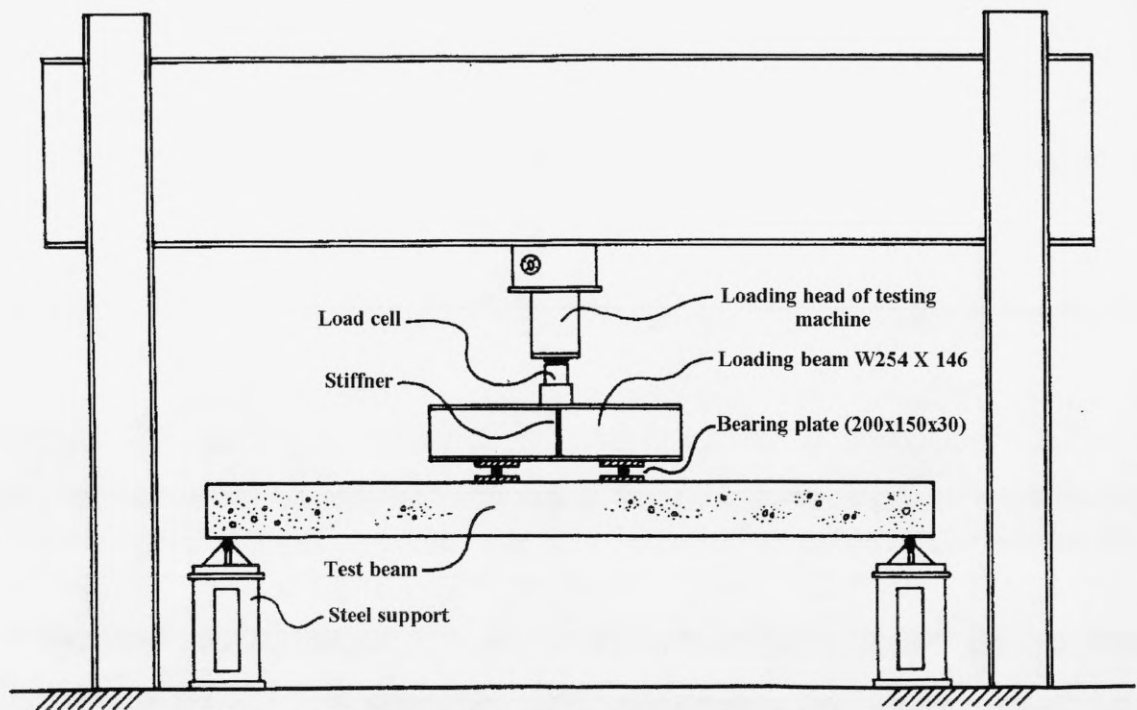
Test arrangement for the beam specimen in flexure
